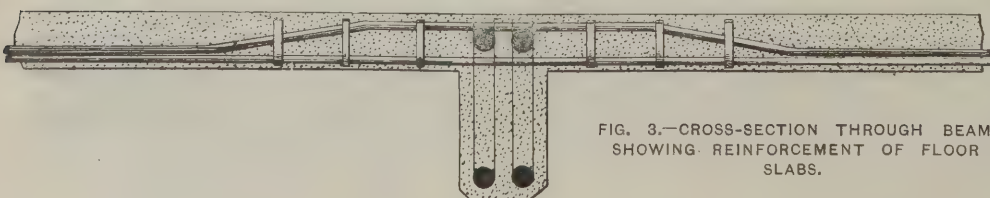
CROSS-SECTION THROUGH BEAM SHOWING REINFORCEMENT OF FLOOR SLABS.
